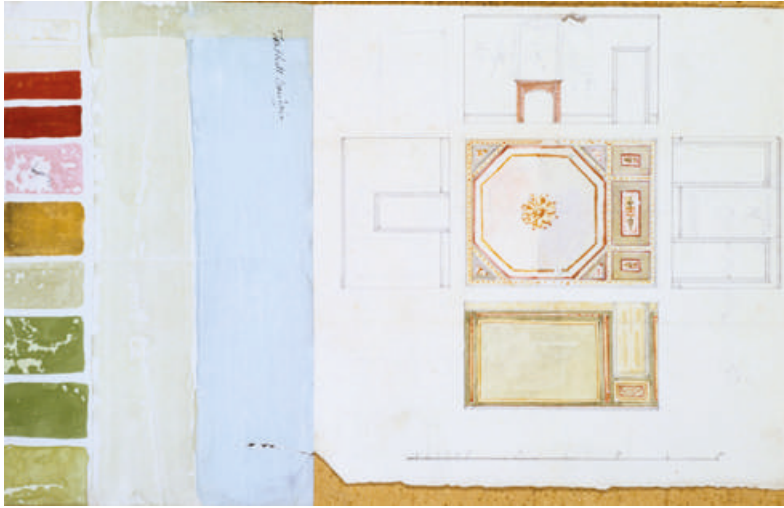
Design by J. B. Papworth for alterations to the interior of the Pavilion, plan of ceiling of Mary Ann Morrison's boudoir.
